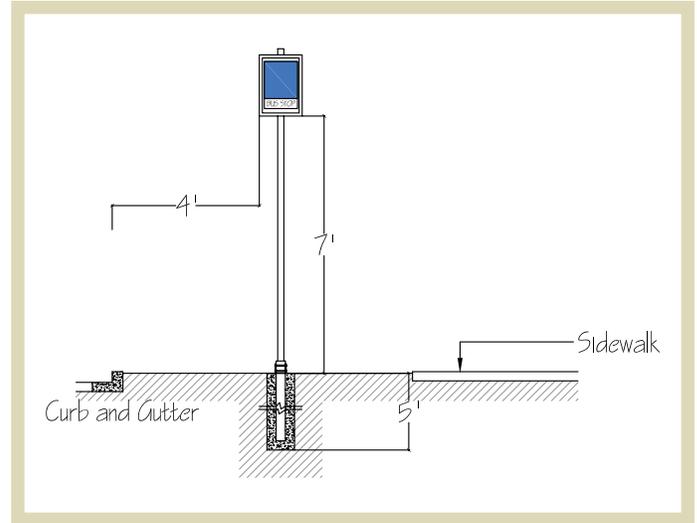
| Dimensions for a bus stop sign placed in a planting strip adjacent to the travel lane.
